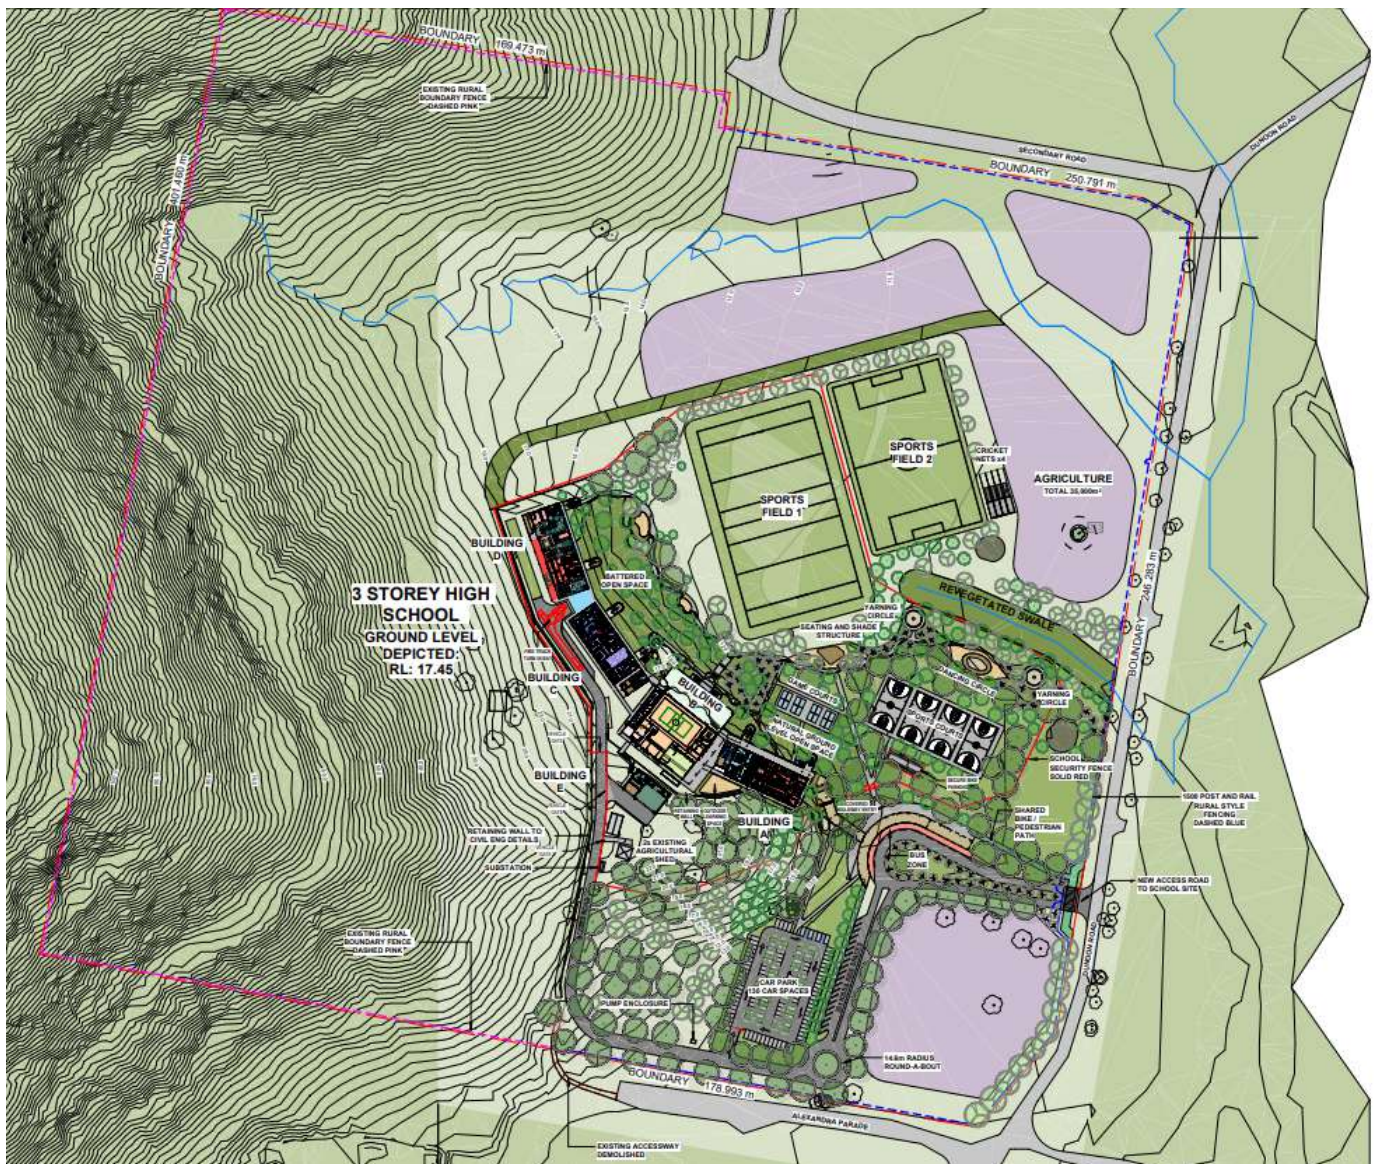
Overall Site Context Plan (Source: EJE Architecture)
